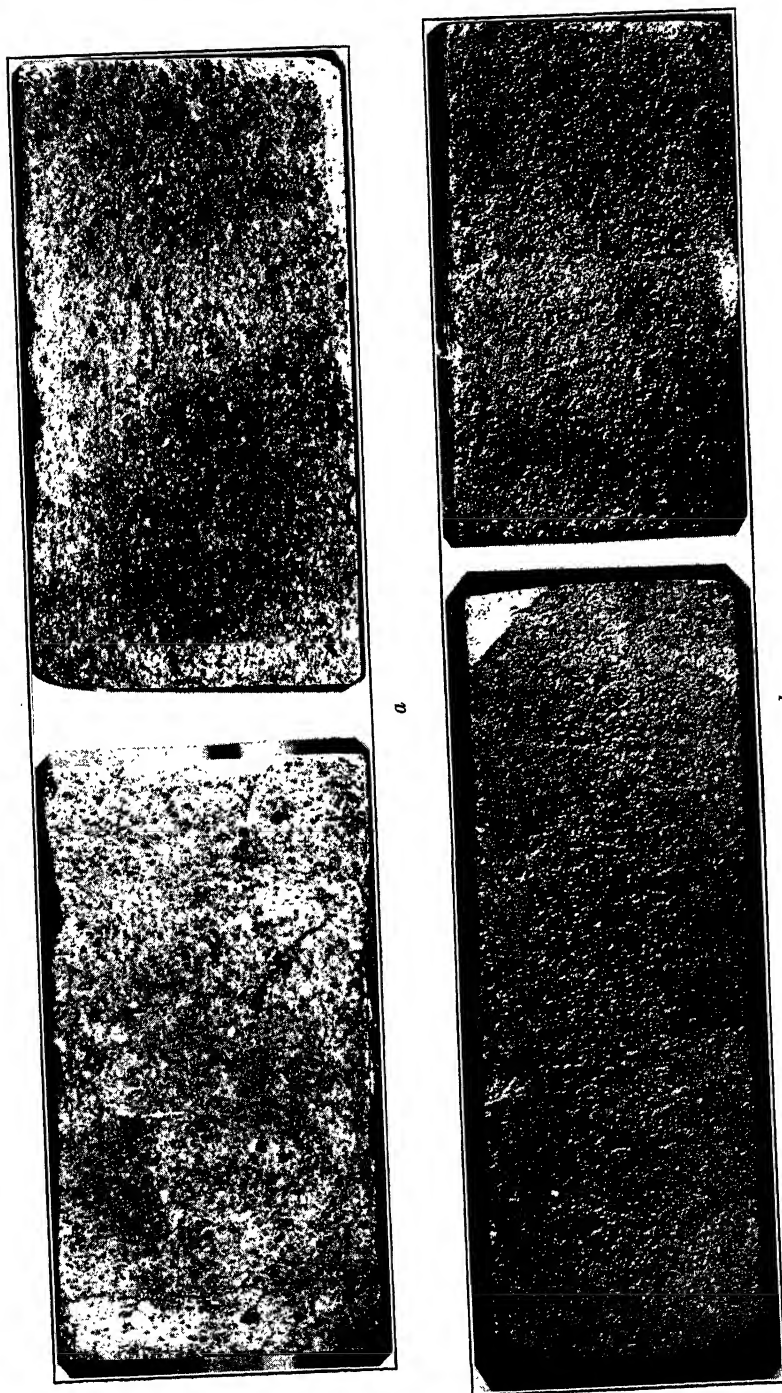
SECTIONS OF BRICK SHOWING LAMINATIONS AND POROUS CORE.
